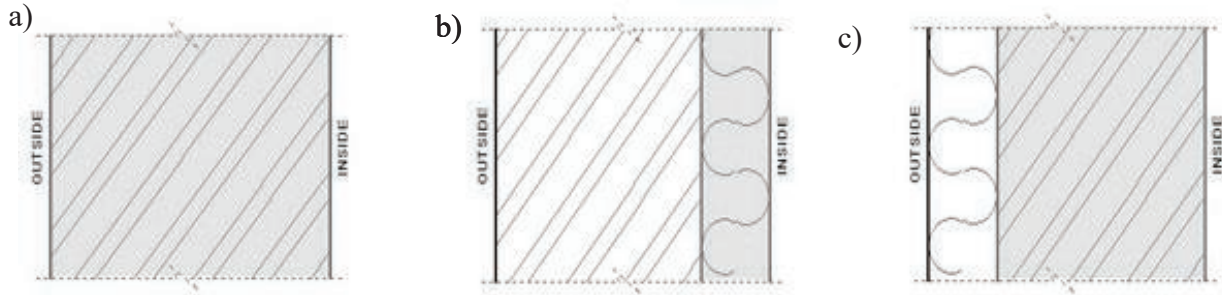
Details of the different layers of walls, (a) Wall of limestone, (b) Wall of limestone with internal thermal insulation (ITI), (c) Wall of limestone with external thermal insulation (ETI)
